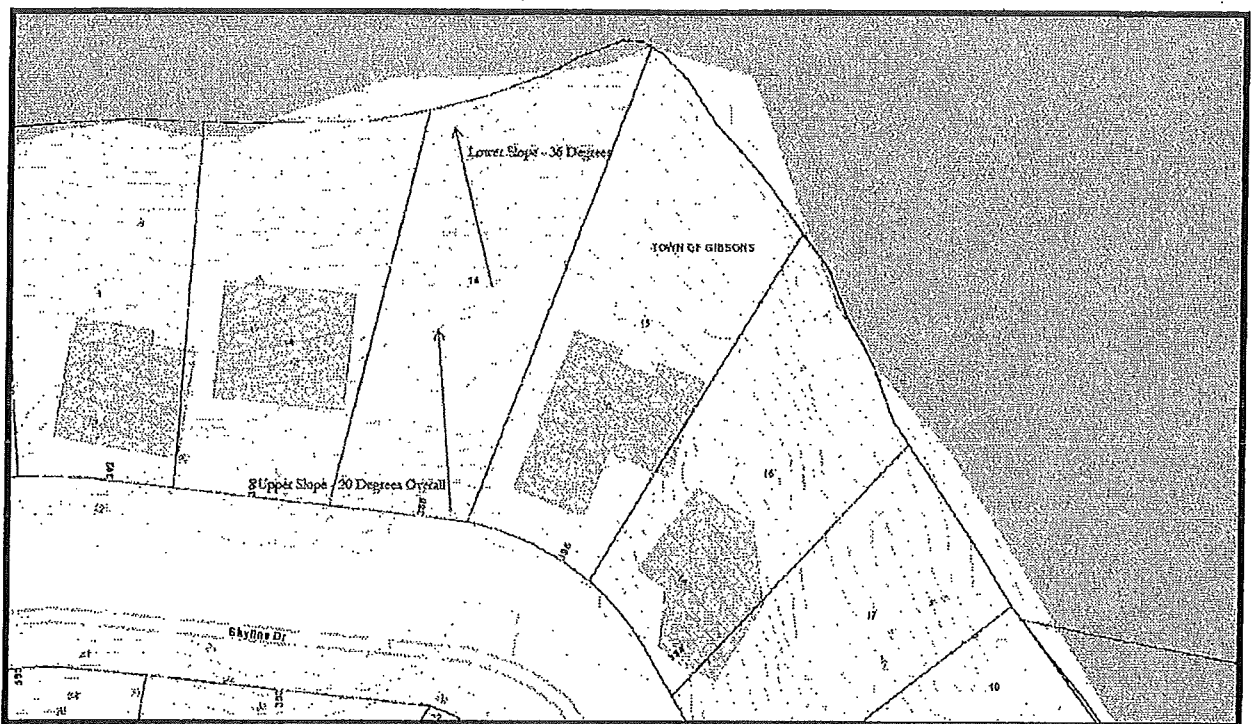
Site topographic plan showing analyzed sections and slope angles for upper and lower slopes.
